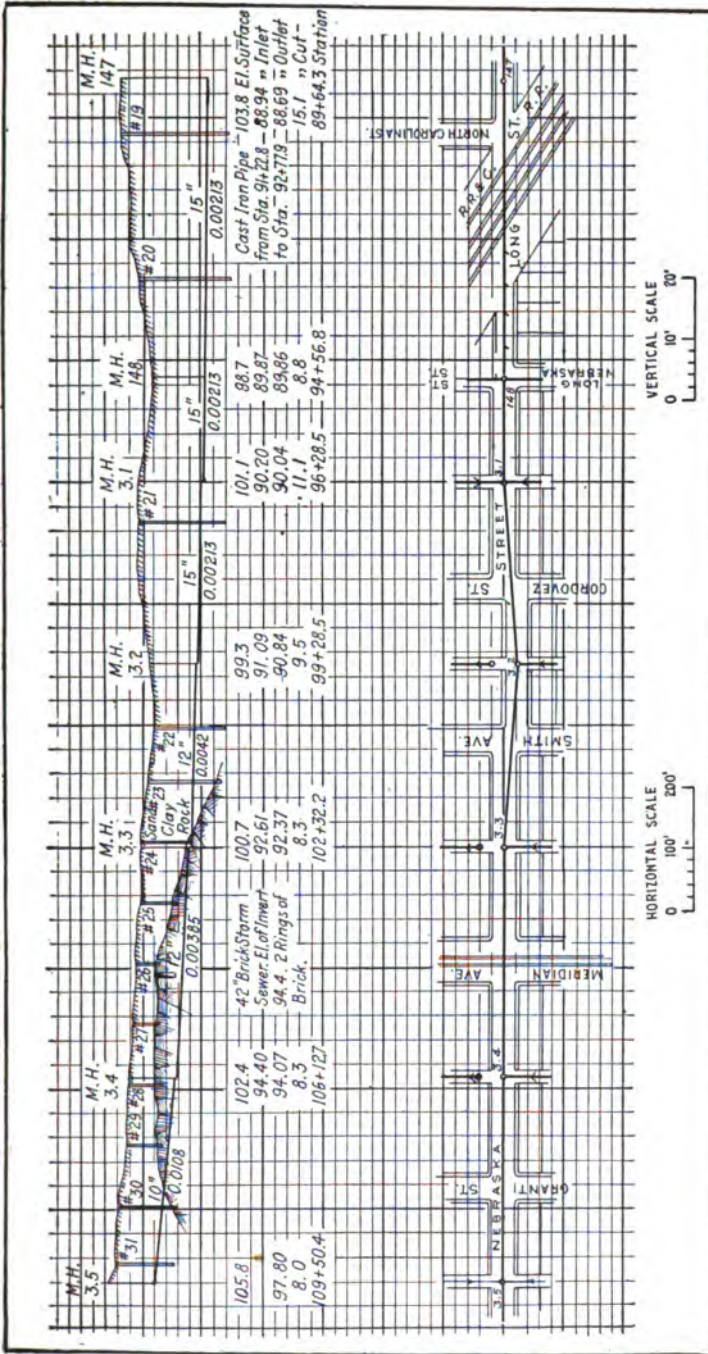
Typical Profile Used in the Design of a Separate Sewer System.
